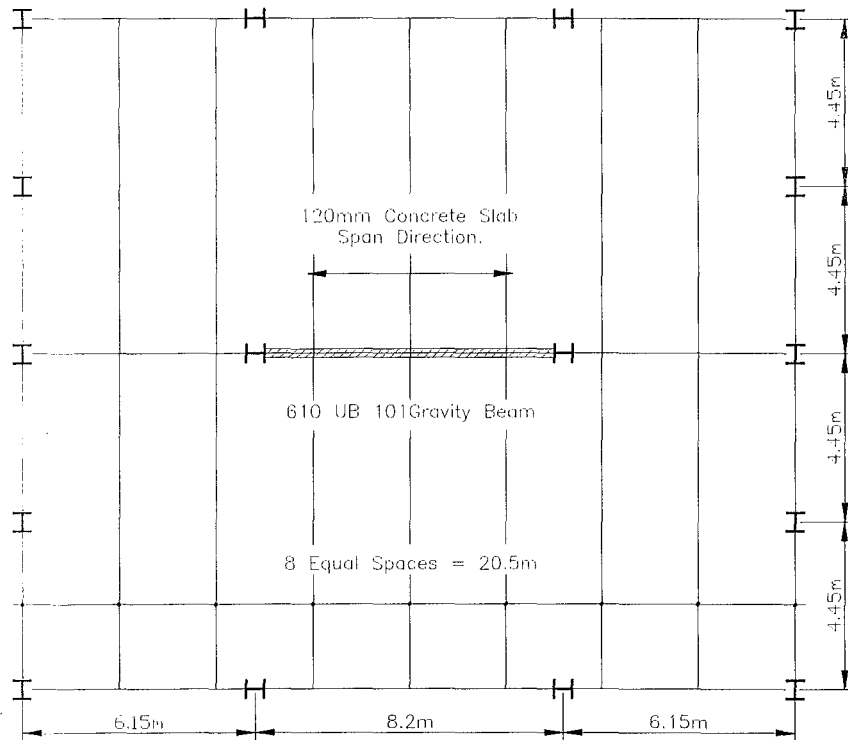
Layout plan of building, from Stevenson (1993).
